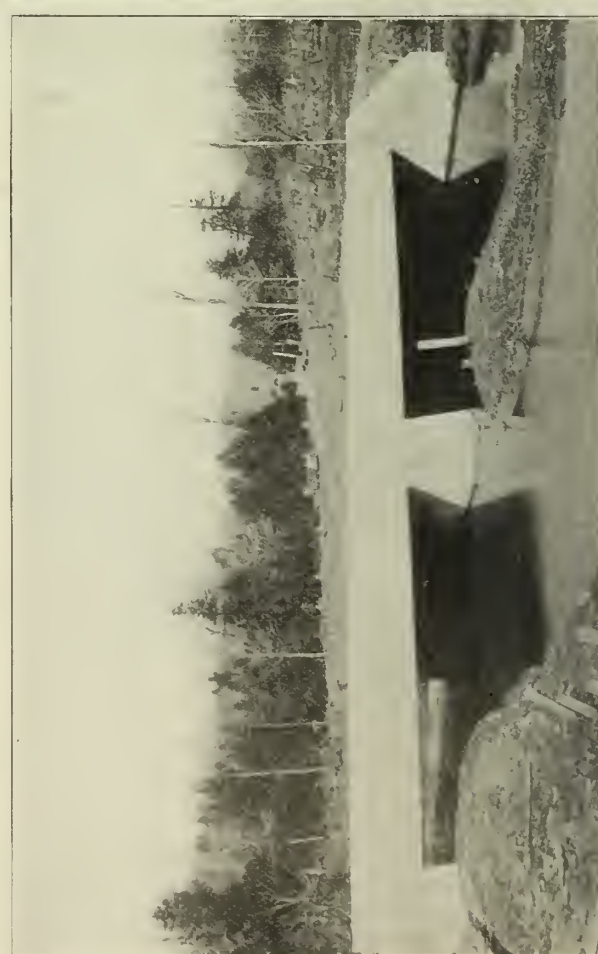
Two 21-Foot, Solid-Floor I-Beam Girder Spans, Western Maryland Extension.
